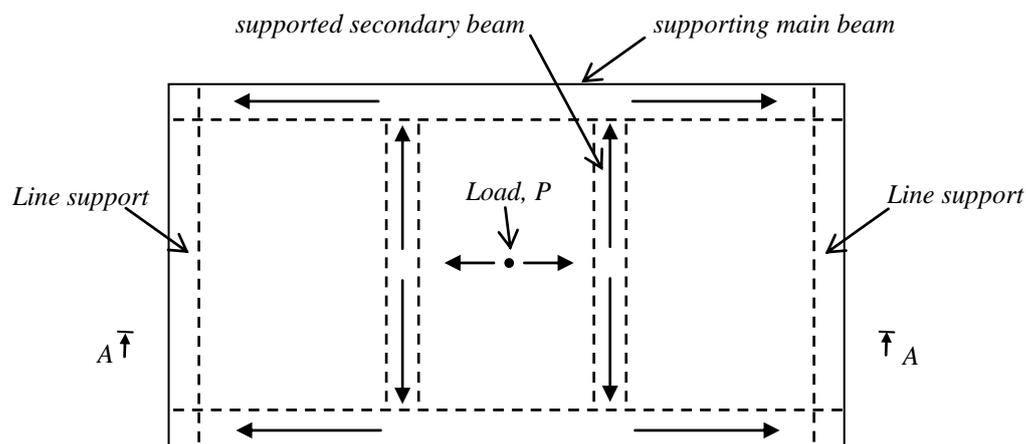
Plan of a concrete structure. The slab carries the load in the transverse direction to the supported secondary beam to the supporting main beam and further down to the supports.
